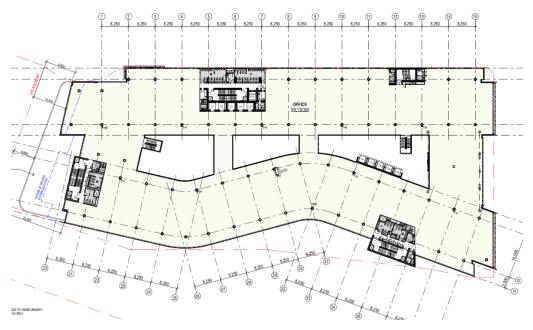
Typical floorplate of Building 1 Source: FJMT + Sissons Architects
